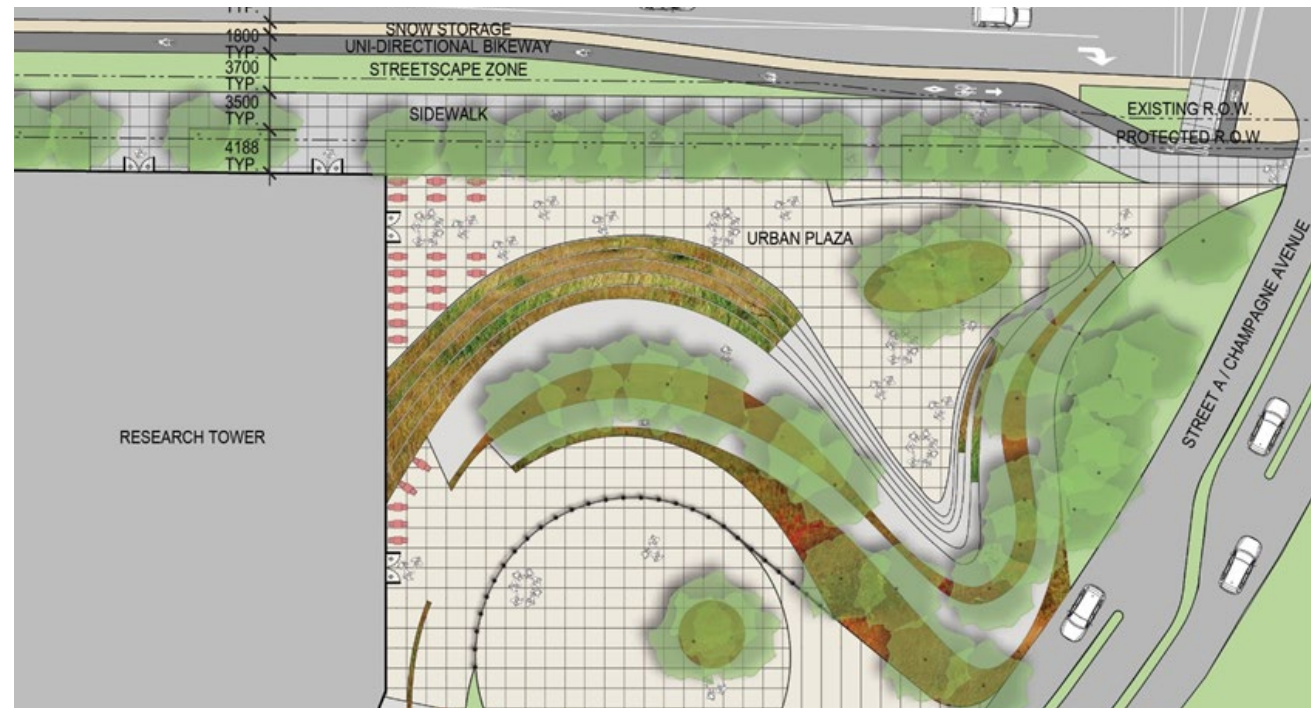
Urban Plaza Plan at the Corner of Carling and Champagne Avenues
